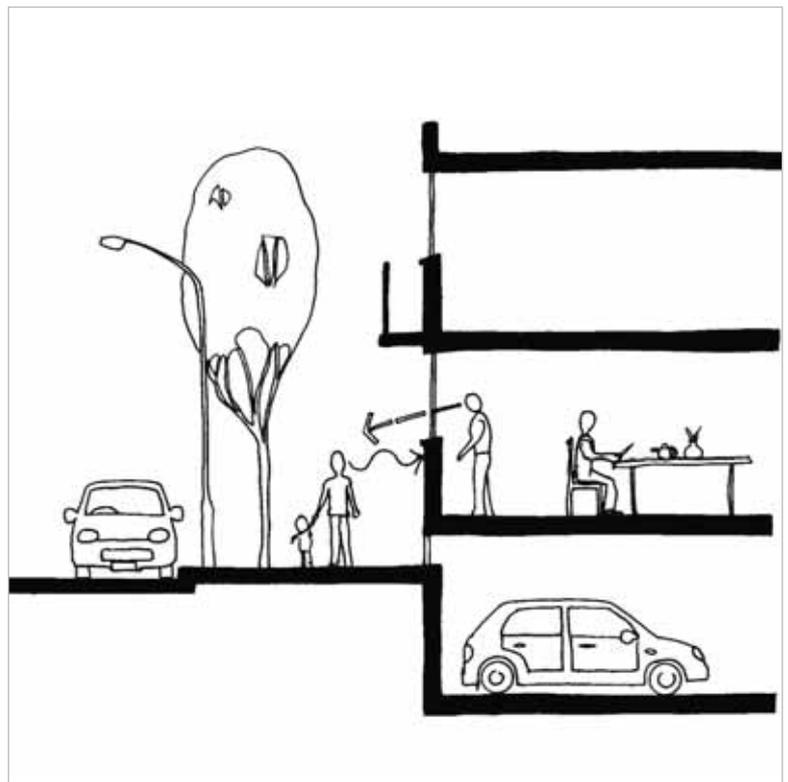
Raising the ground floor level 300 - 400mm using undercroft parking can be effective.
